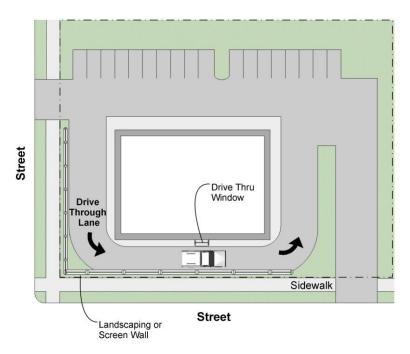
Suburban Context – Landscaping or Screen Wall and Drive-Through Location
